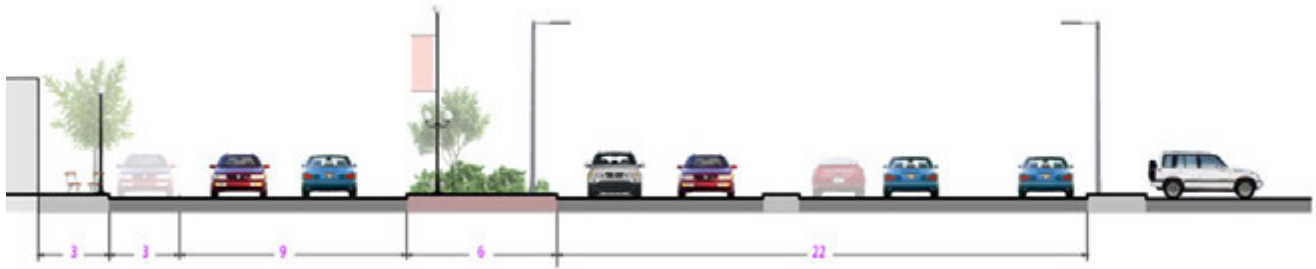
Avenue A South Street Section to Idylwyld Drive
